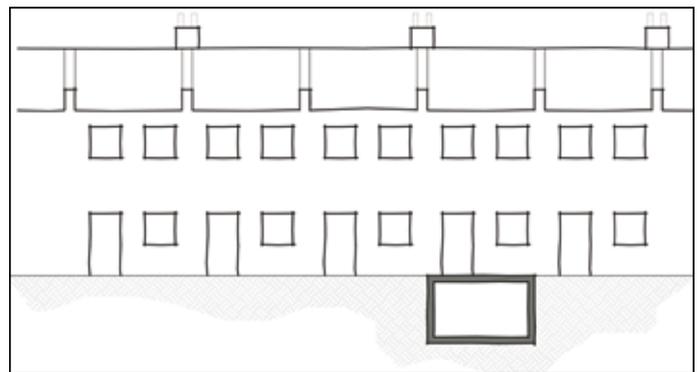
Typical terrace of houses with retrofit basement introduced beneath one house
